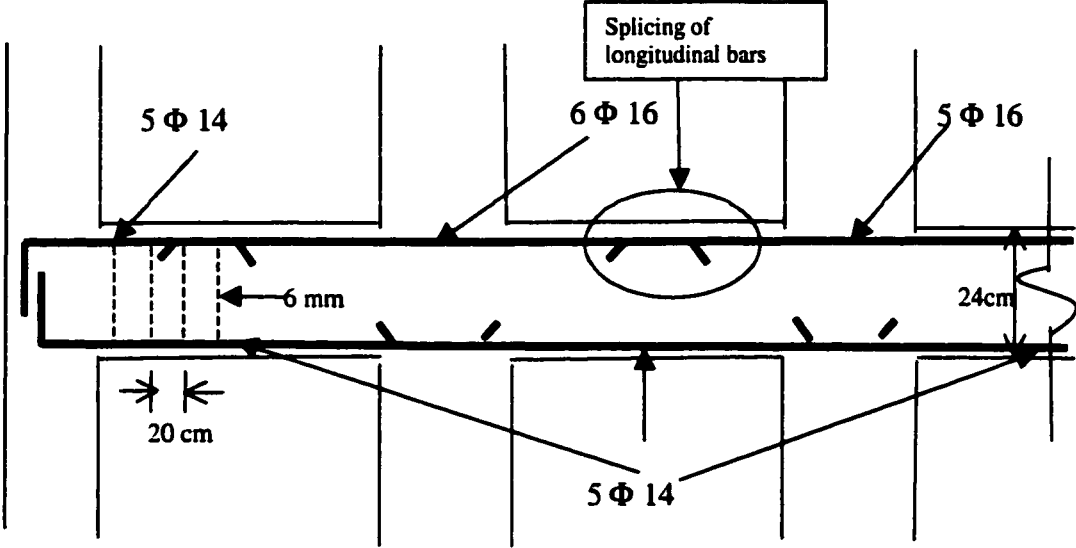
Longitudinal reinforcement in exterior beams⁵⁵
